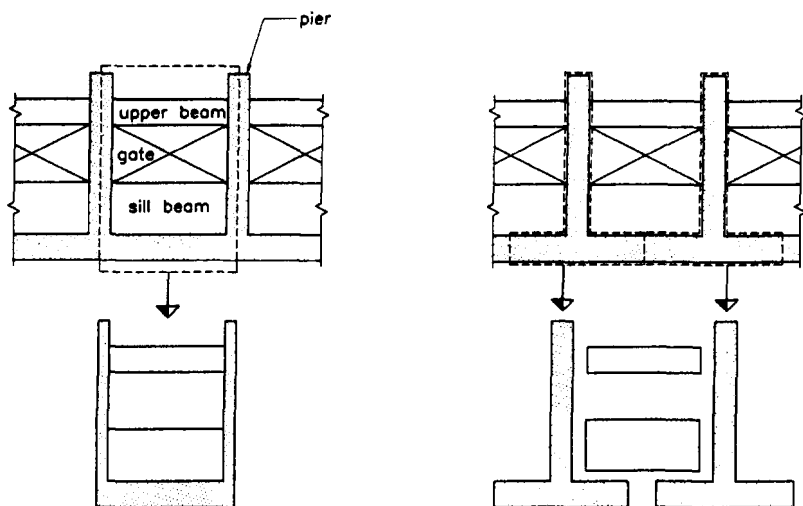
Prefab method 1 (left), characterized by a joint at the pier and prefab method 2 (right), characterized by a joint between piers, upper beams and sill beam.
